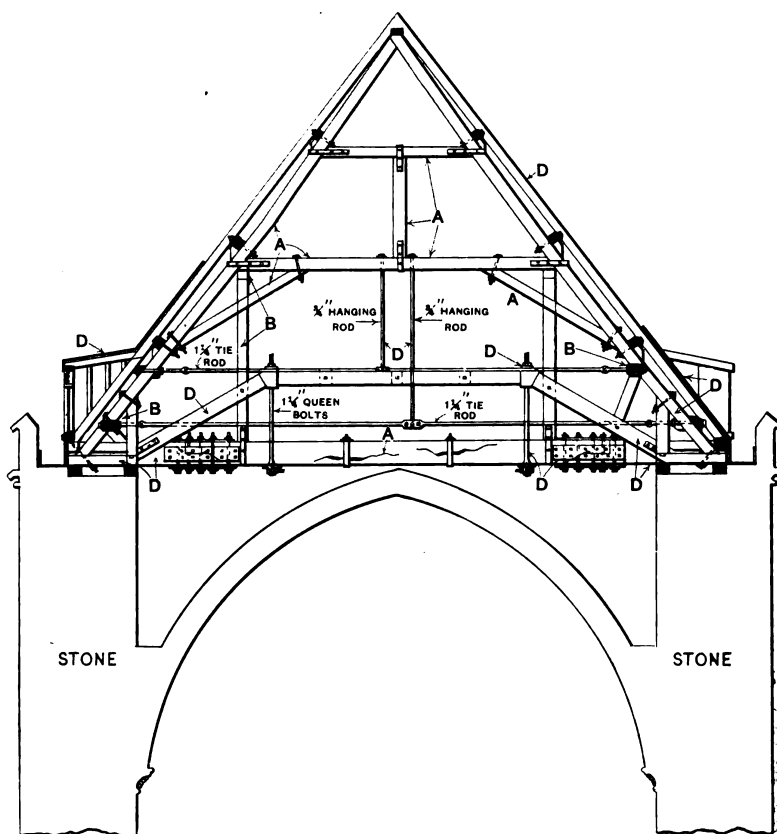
Vertical Cross Section of Roof After Work Was Completed.
